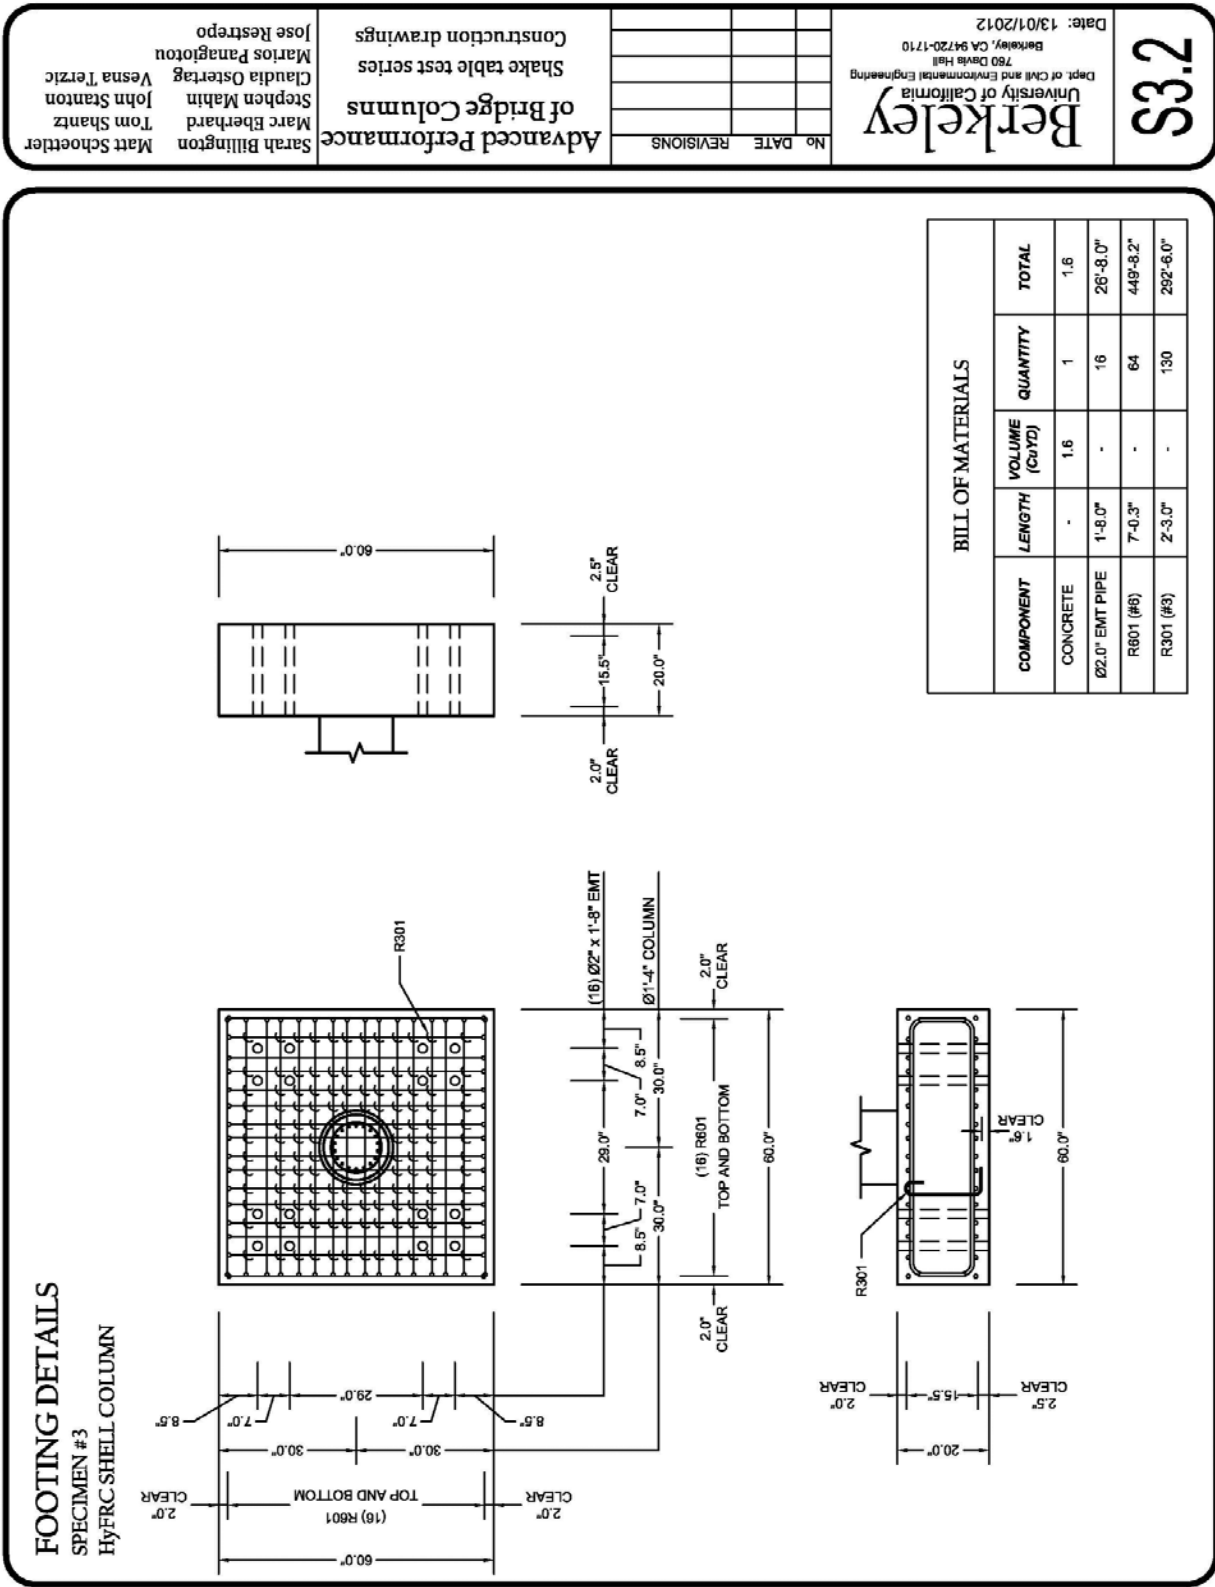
Reinforcement for column load stubs and footings (cont.).
